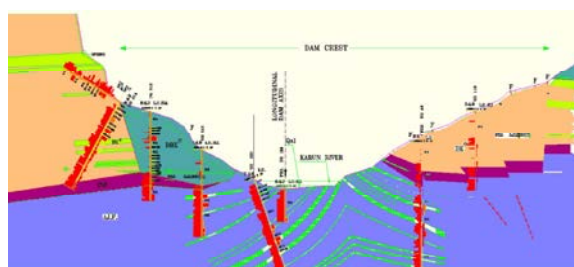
Typical cross section of foundation of Gotvand-olya dam
